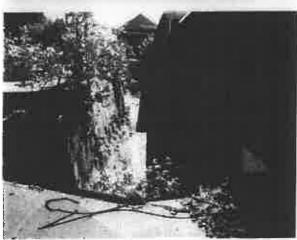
Wooden Demolition Debris Stacked Against Southerly Wall of Partially Demolished Building
